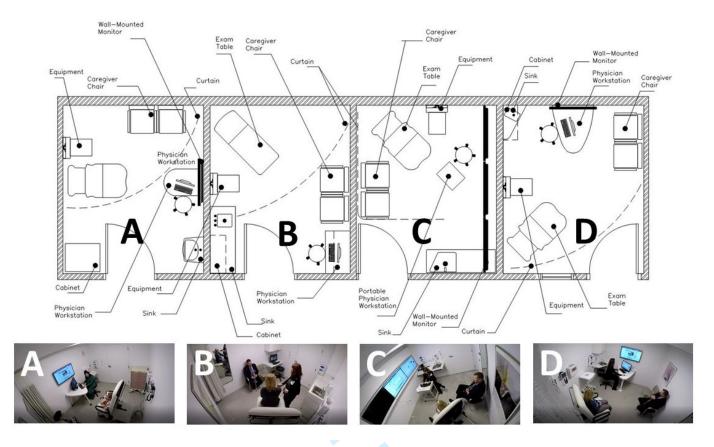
The four exam room layouts. Floor plans of full-scale mock-ups highlighting various physical features.
